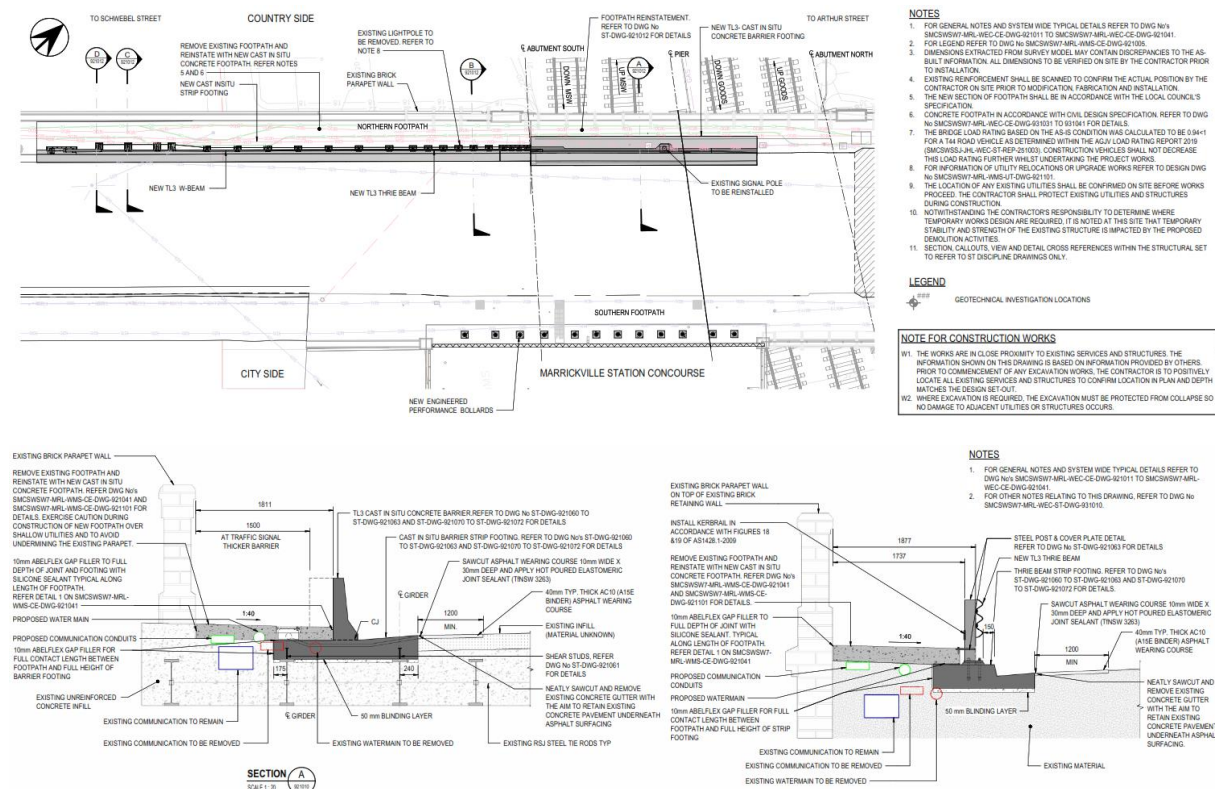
Plan of treatment works for Illawarra Street Bridge (Source: Aurecon 2024, provided by ARCH Artifex)
